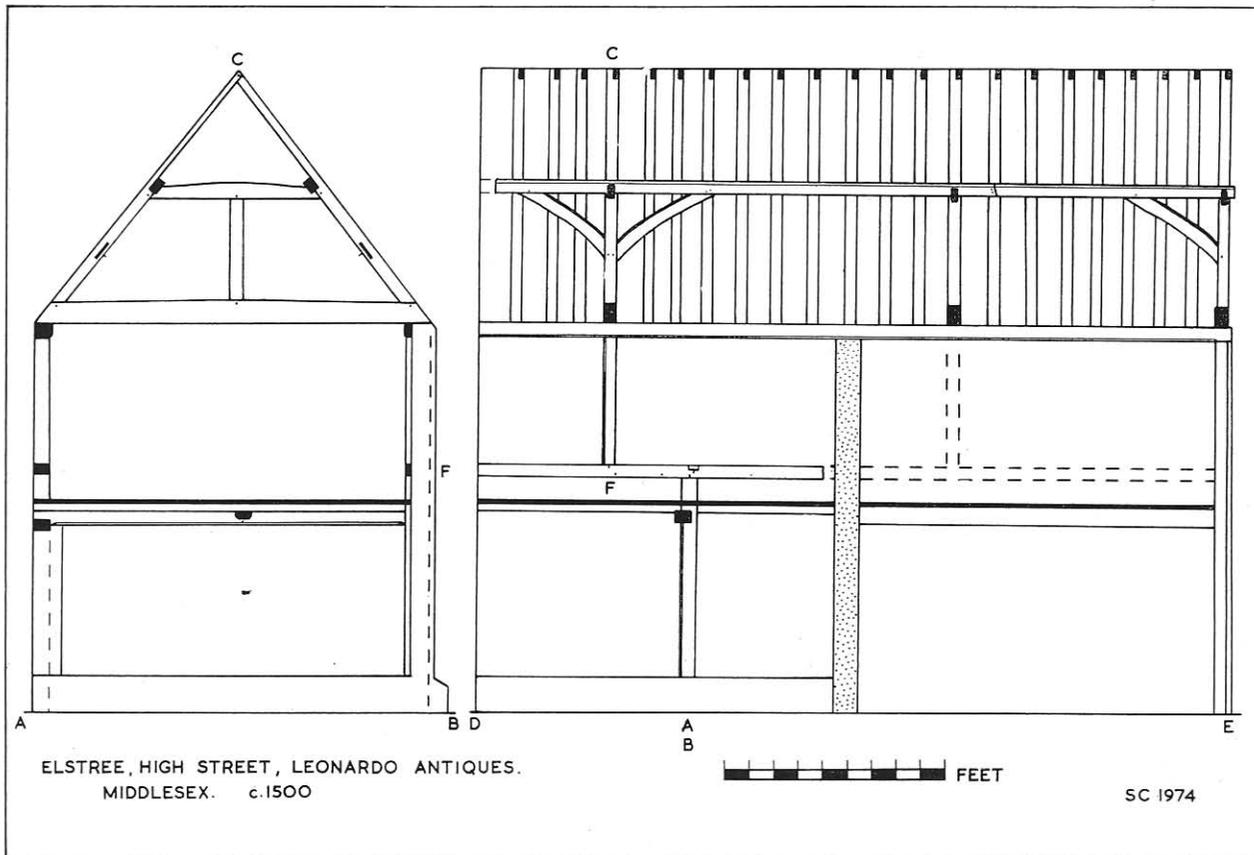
Leonardo's cross and longitudinal sections of hall showing inserted first floor, lower ring-strut roof truss (left) and arch wind-braces (right).
